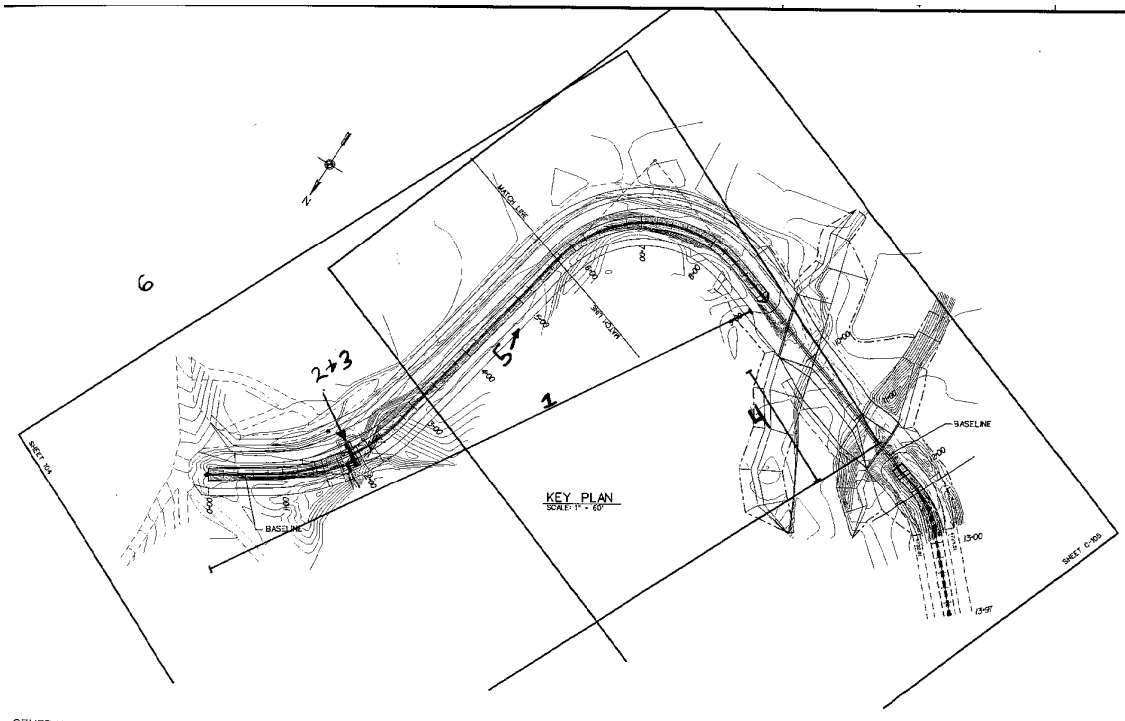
Key Plan of the Proposed Project Adapted from: La Joya Acequia System improvements Phase III Key Plan and General Notes sheet no. C-102
